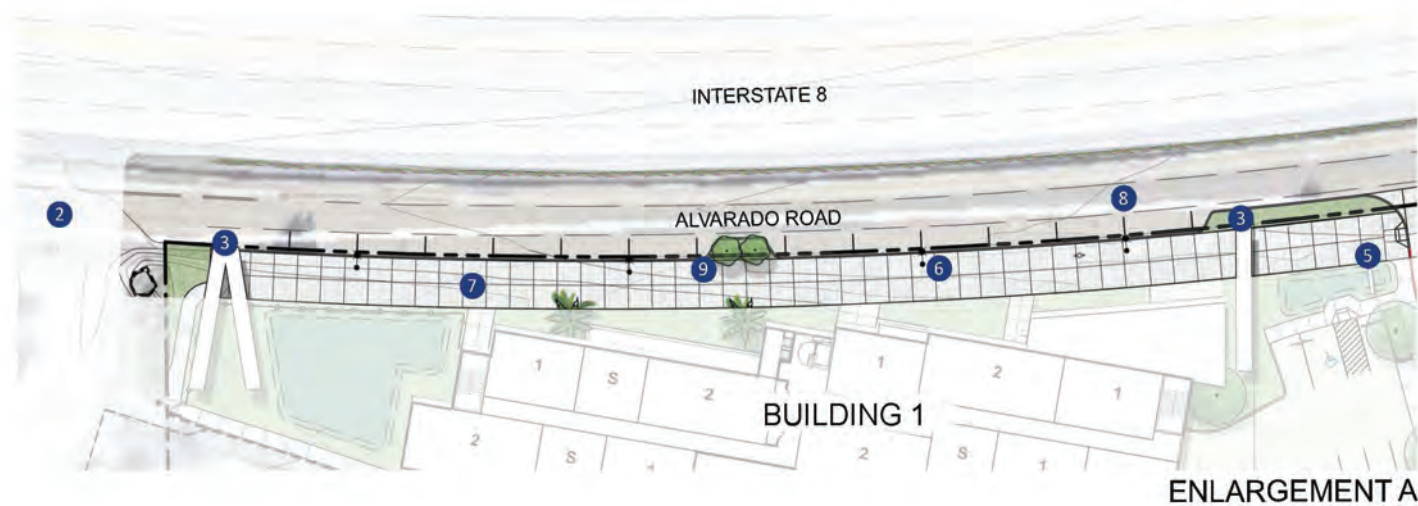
Plan View of Alvarado Road Streetscape Improvement Plans
